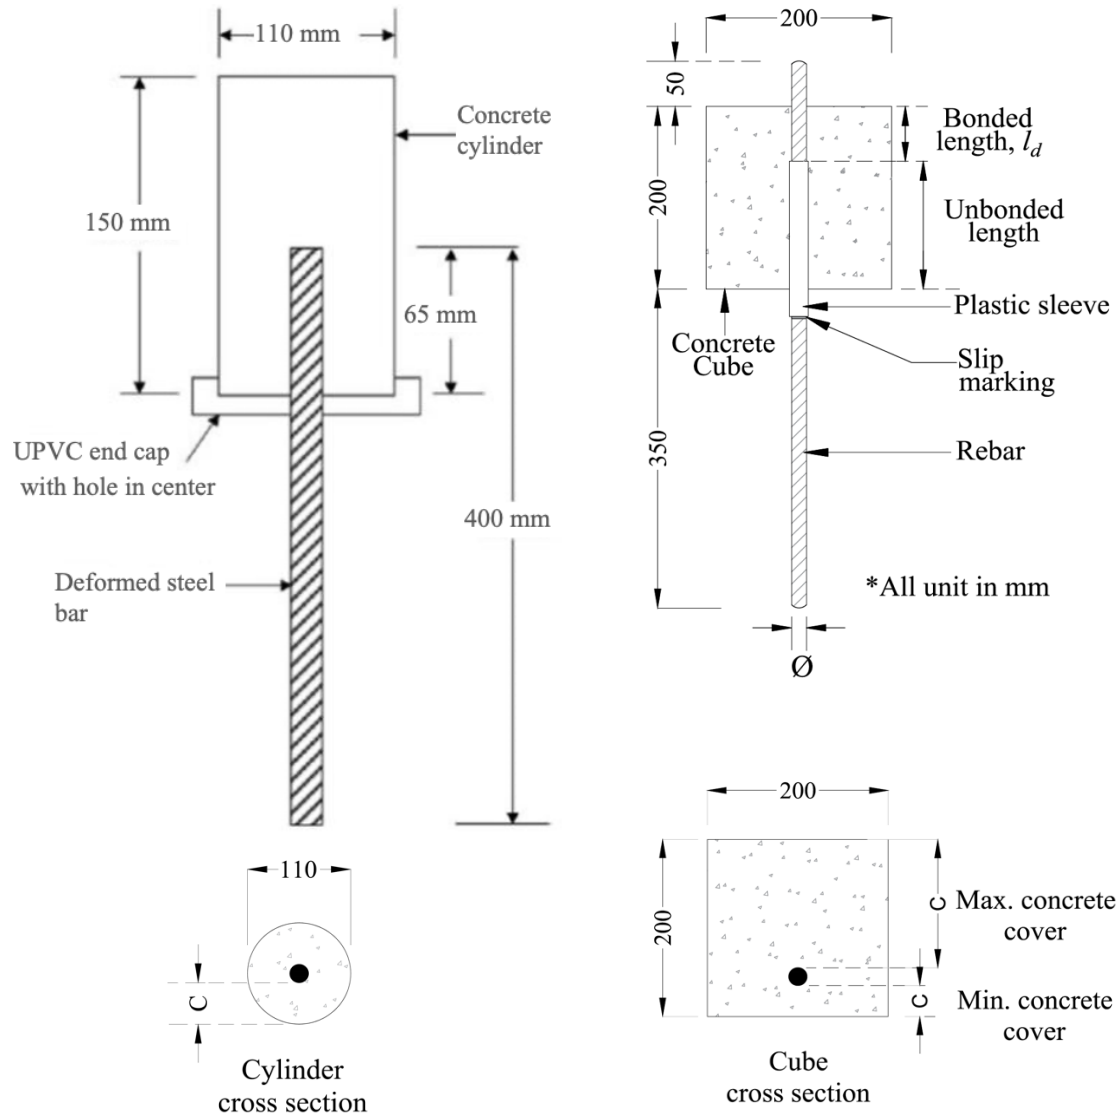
Thickness of concrete cover and position of rebar in cube pullout specimen
